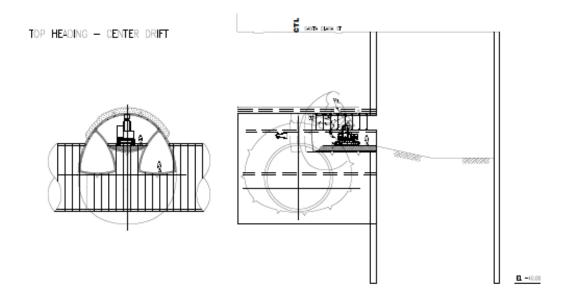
Cross Cut Excavation - TBM First - Top Heading Center Drift
